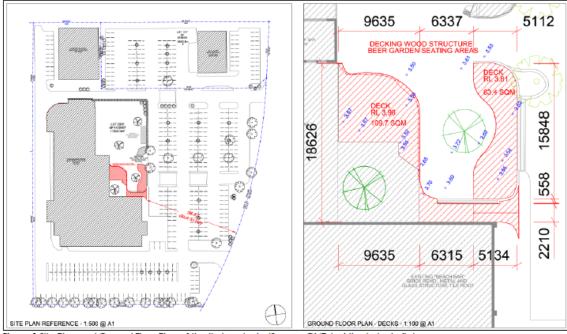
Site Plan and Ground Floor Plan of the timber decks (Source: CMT Architects Australia)
